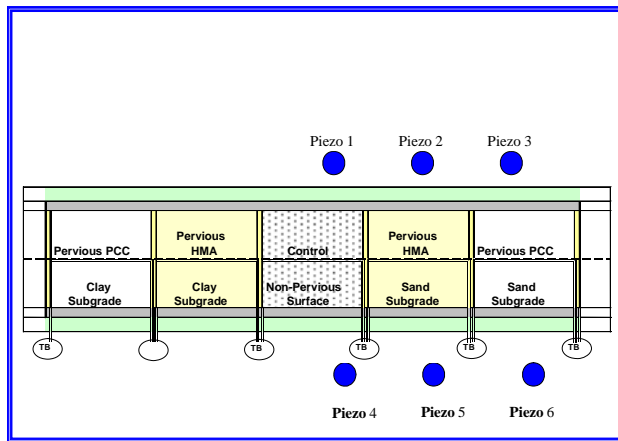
; Layout Of Proposed Pervious concrete Cells in LVR
